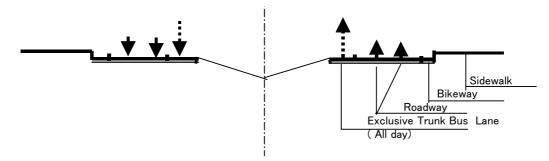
Typical Cross Section Location of Exclusive Trunk Bus Lane
